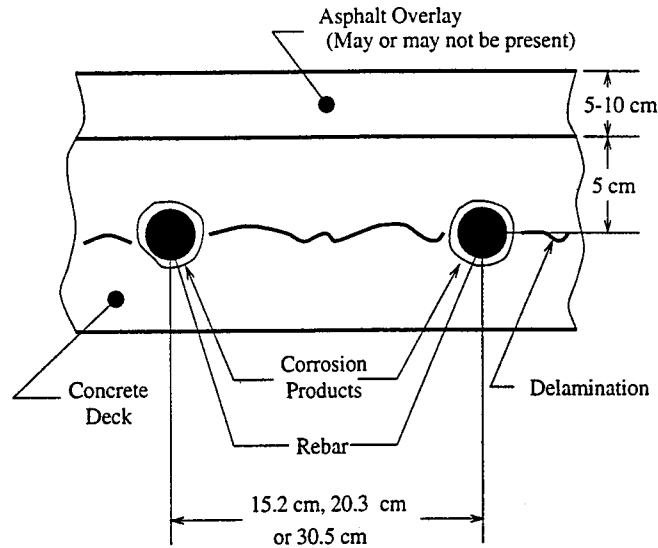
Delamination of a concrete bridge deck due to corrosion of the reinforcing rebar [Warhus *et al.*, 1997].
